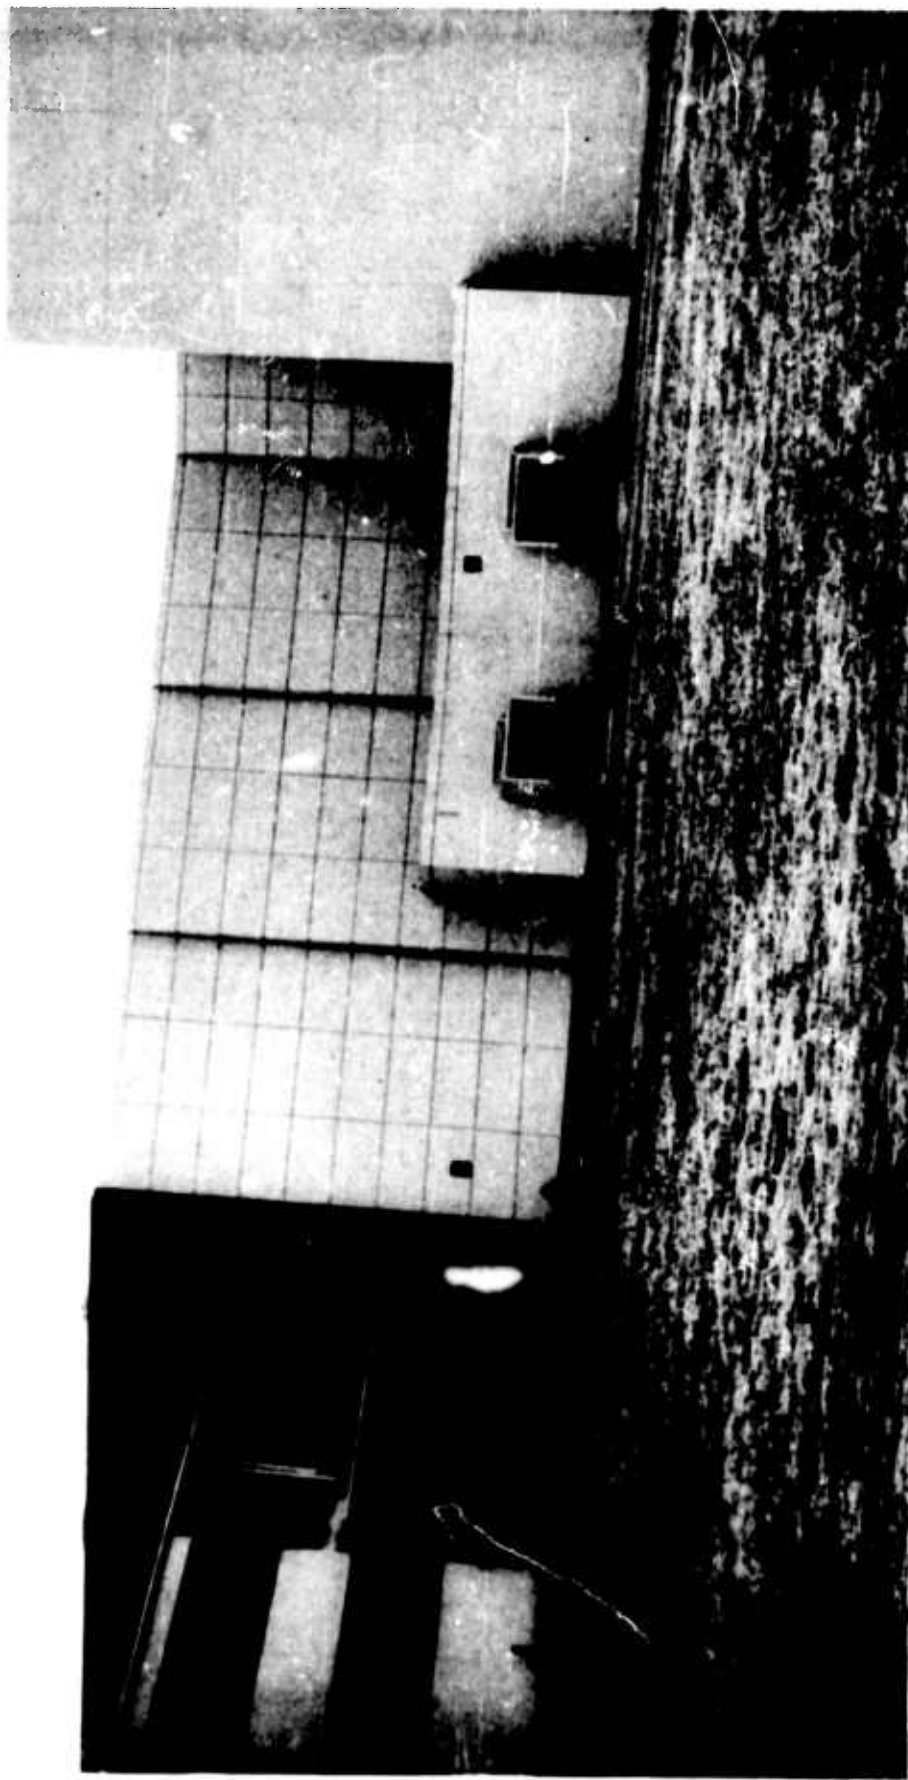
West Anchorage High School (East wall of undamaged auditorium)
